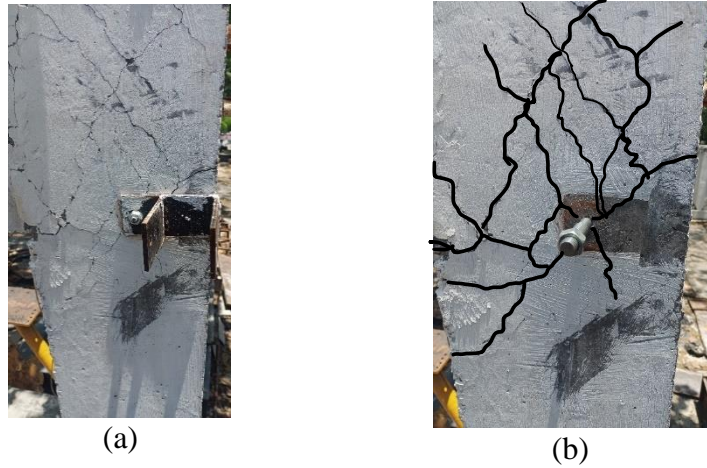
(a) Image of cracked joint with bracket (b) Mapped cracking and cracks passing through anchors
